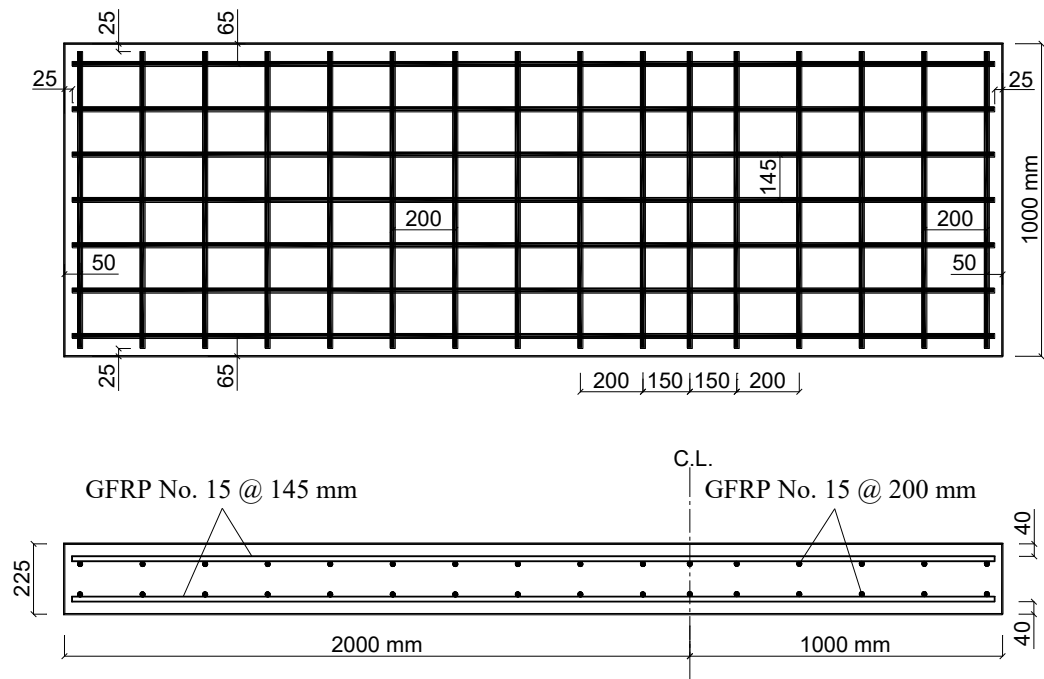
Concrete dimensions and reinforcement details of reference specimen (G-R-15-A)
